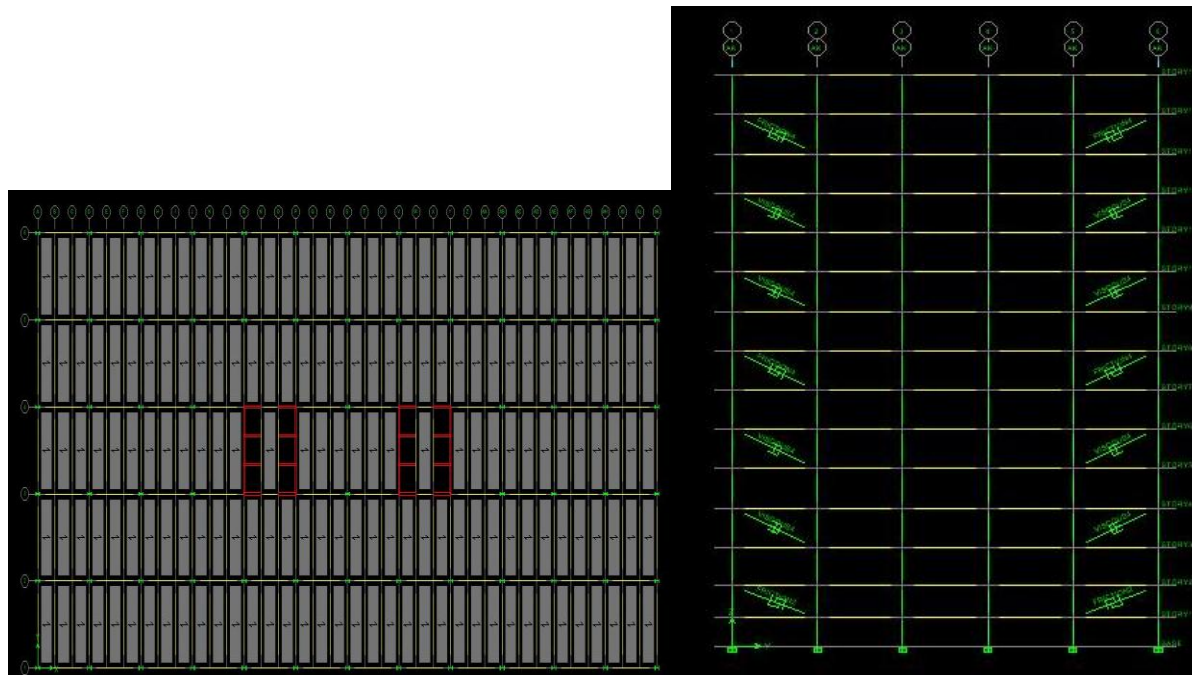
Typical floor plan Figure 2: Typical Y direction frame with dampers
